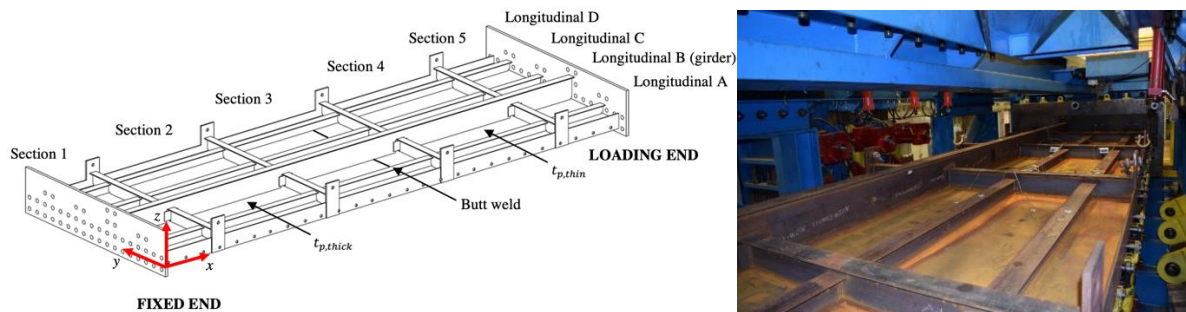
(Left) Geometry of the physical model (reference structure), and (right) a photograph of the experimental setup with the physical model installed in the testing machine.
